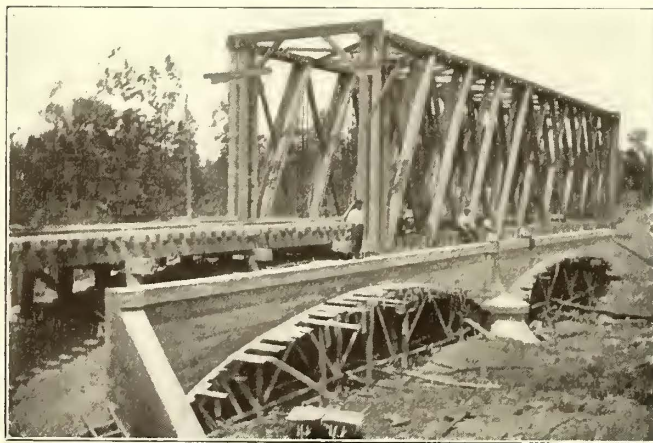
Bridge Reconstruction on Columbus & Lake Michigan Railway—Old Howe Truss Bridge in Use Before Completion of Two-Arch Bridge Shown in Figs. 1 and 3
